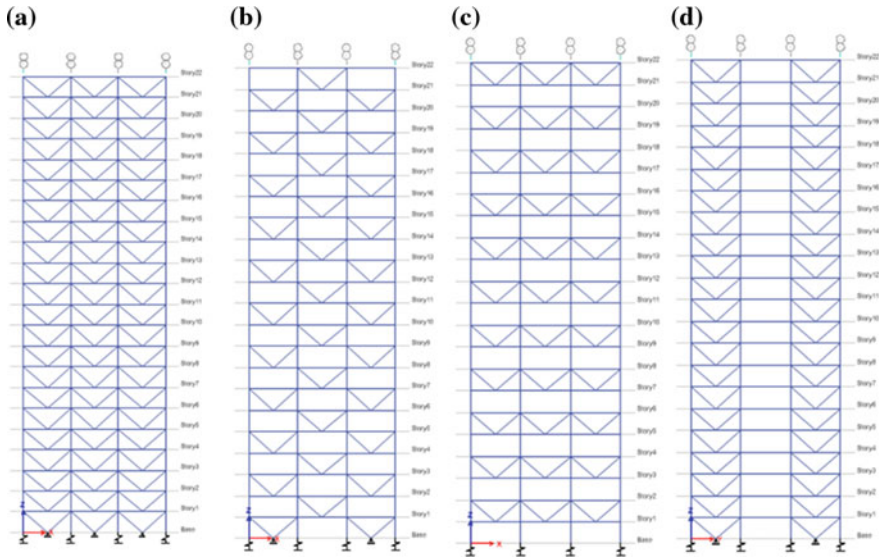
Elevation of 22 storey diagrid buildings with V bracing pattern arrangement (a whole, b alternate, c horizontal, d vertical)
